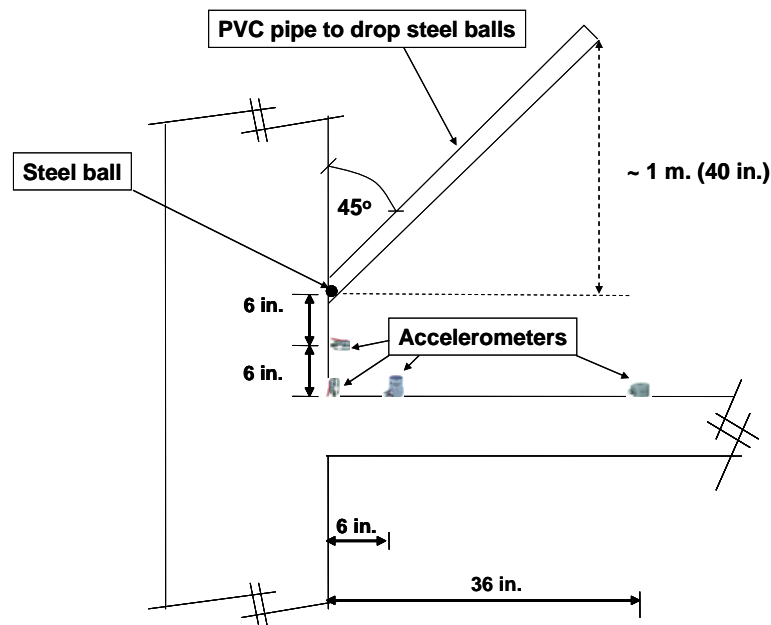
PVC pipe used to drop steel balls on concrete column
